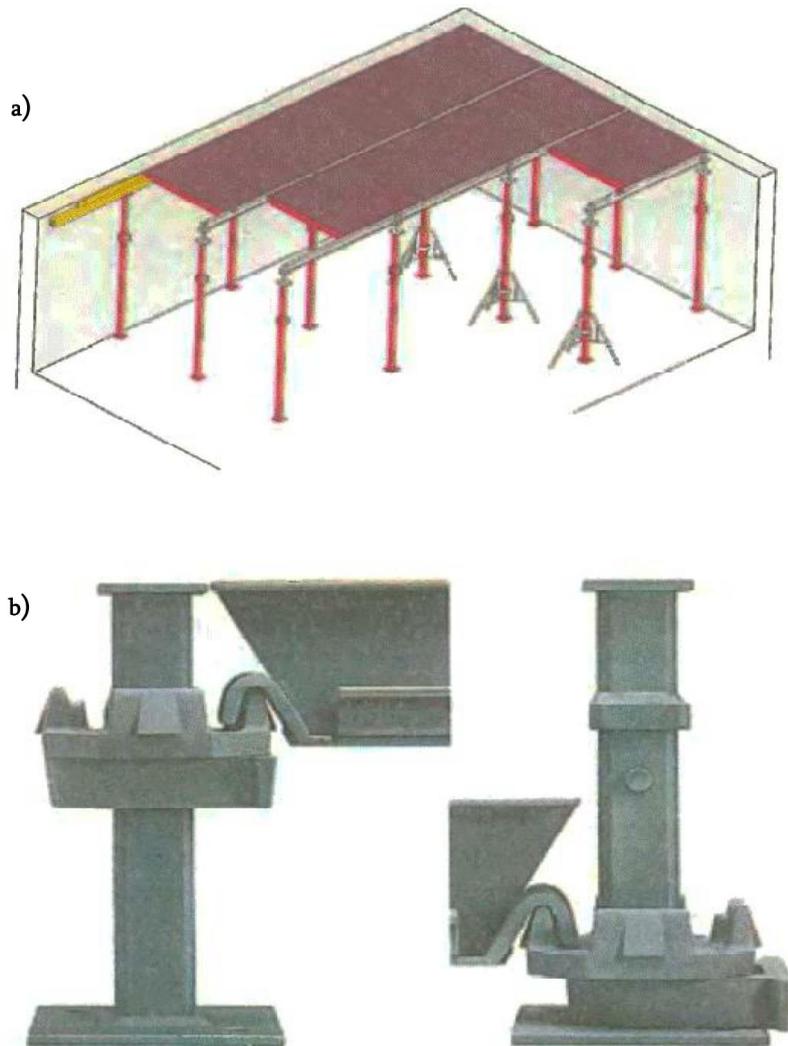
"Noes" roofing mold with falling heads: A - ceiling mold with falling heads; b - longitudinal Anvil with a falling head
